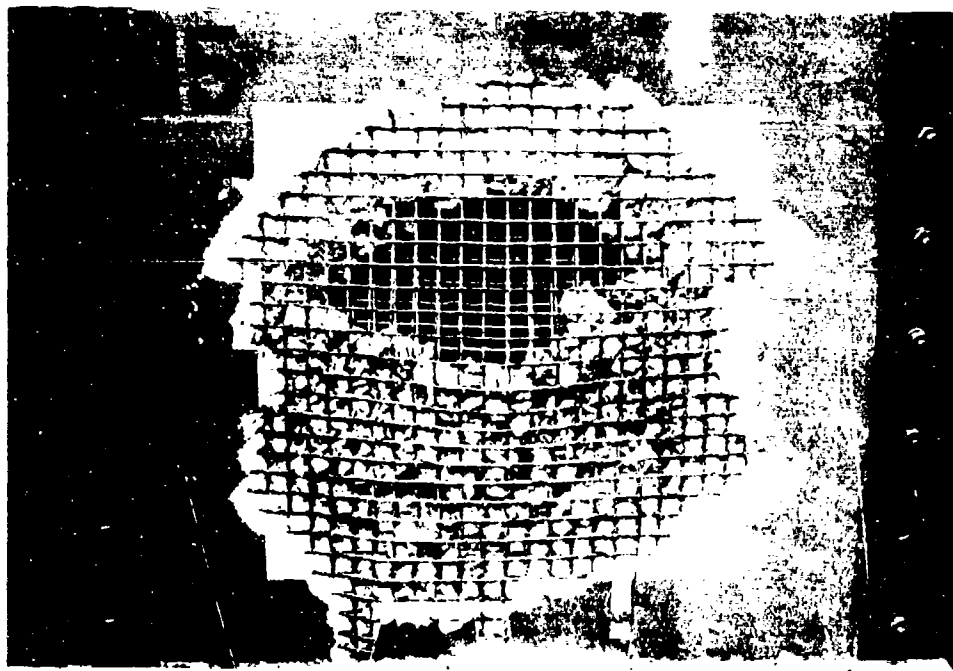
Test 15 Wall Damage Detail (Type B, 2.4-Pound Cased Charge.)
